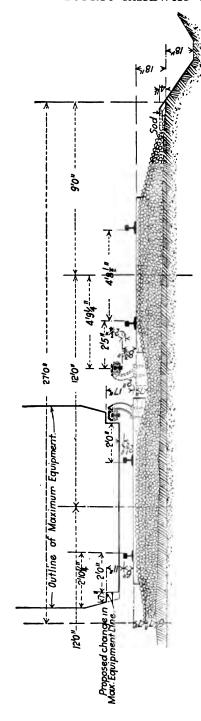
Half Cross-Section of Four-Track New York Central Lines.
